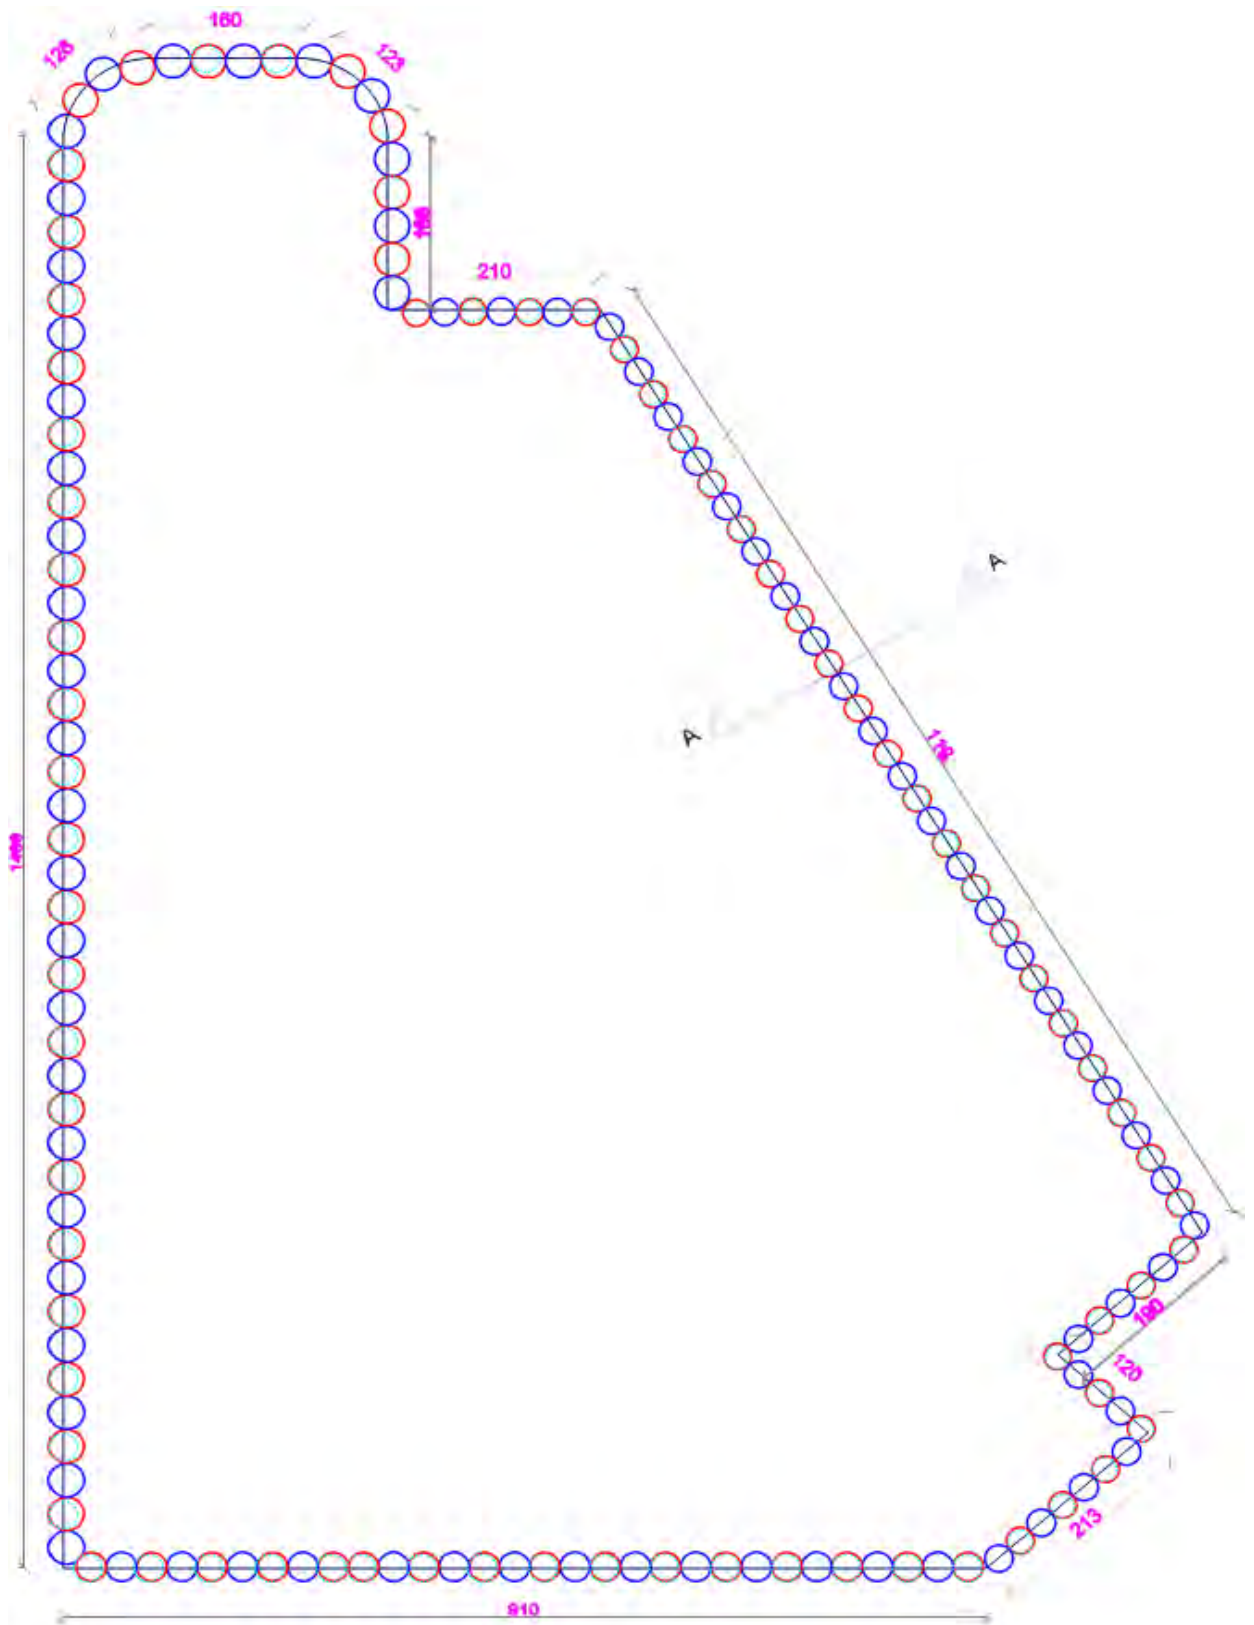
Site layout for the alternative wall scheme for using secant pile wall (All dimensions in cm)
